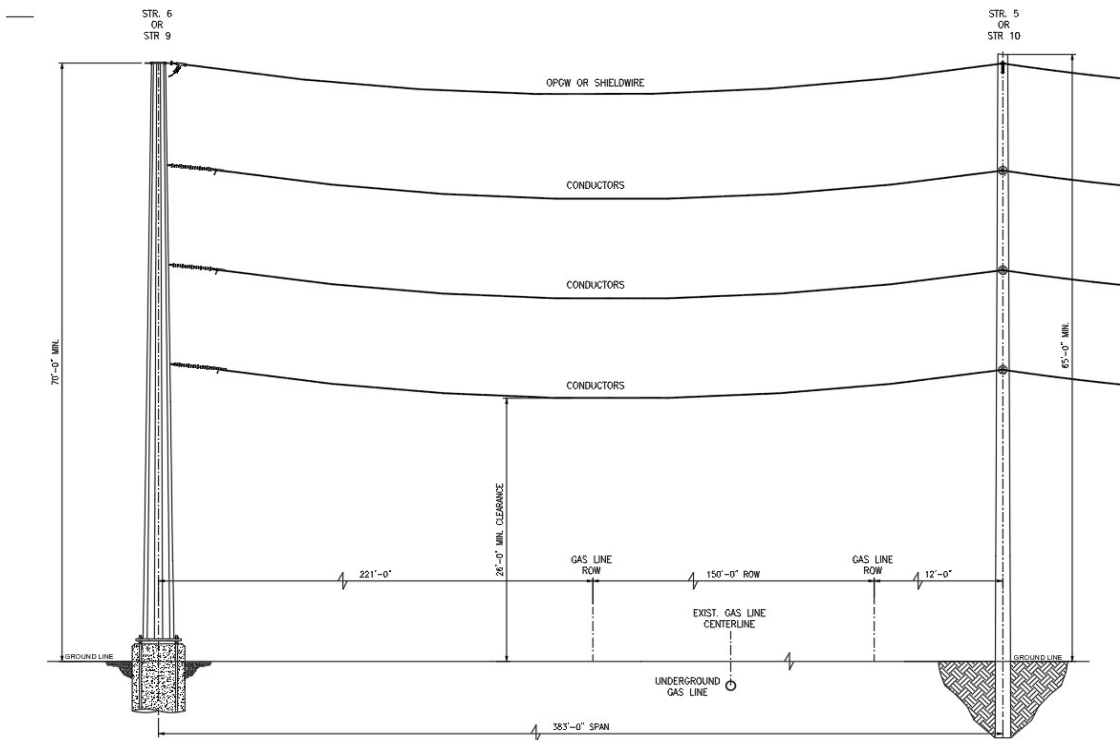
Typical Exist. Gas Line Cross Section – Segment 2
